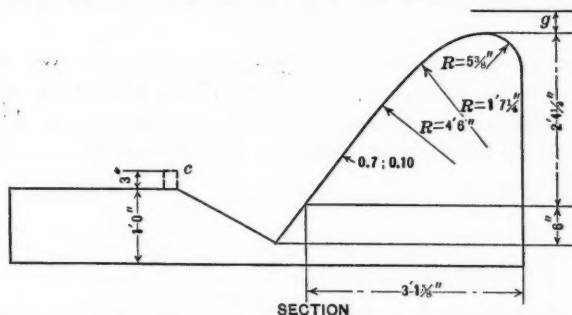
DETAILS OF MODEL WITH FRENCH DESIGN 'SETTLING POOL, PIT No. 4 DAM.
